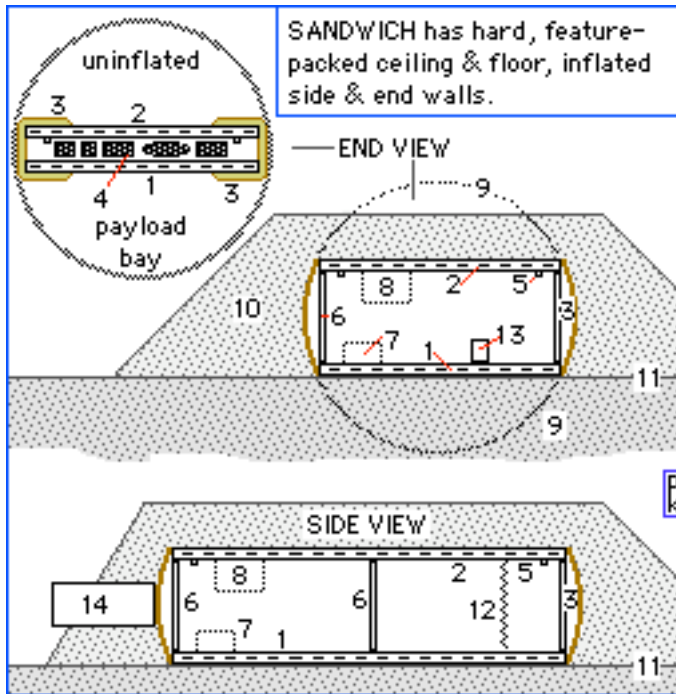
The Sandwich: [1] Floor module with pop-up built-ins. [2] Ceiling module with pull-down units. [3] Inflatable sidewalls and end walls.. [4] Collapsed loose furnishings [5] Cove-lighting tubes or bulbs [6] Contingency support poles & utility chases [7] Representative floor pop-up feature [8] Representative ceiling pull-down feature [9] (Curvature of inflation extended) [10] Soil overburden for shielding [11] Original graded & compacted ground contour [12] Pull-down pleated room divider [13] Representative loose furniture item [14] Docking tunnel
